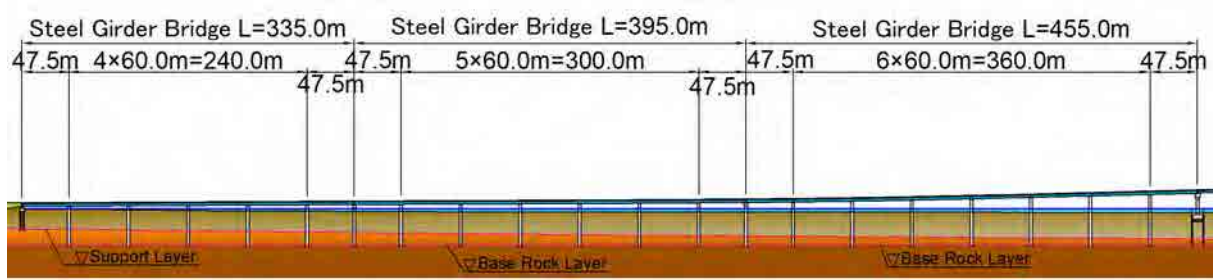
Layout of the Left Bank Approach Bridge (Route2)
